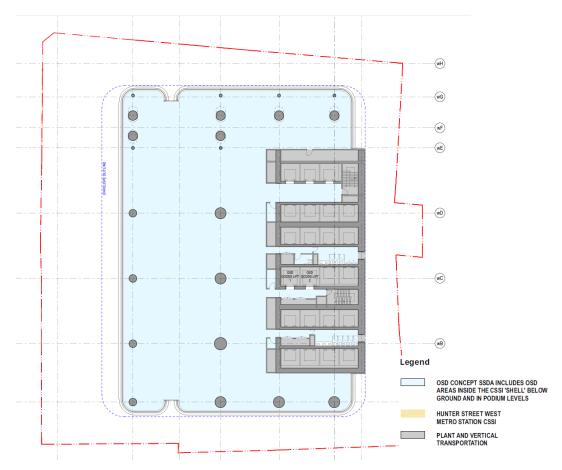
Typical tower (mid-rise) indicative reference plan
